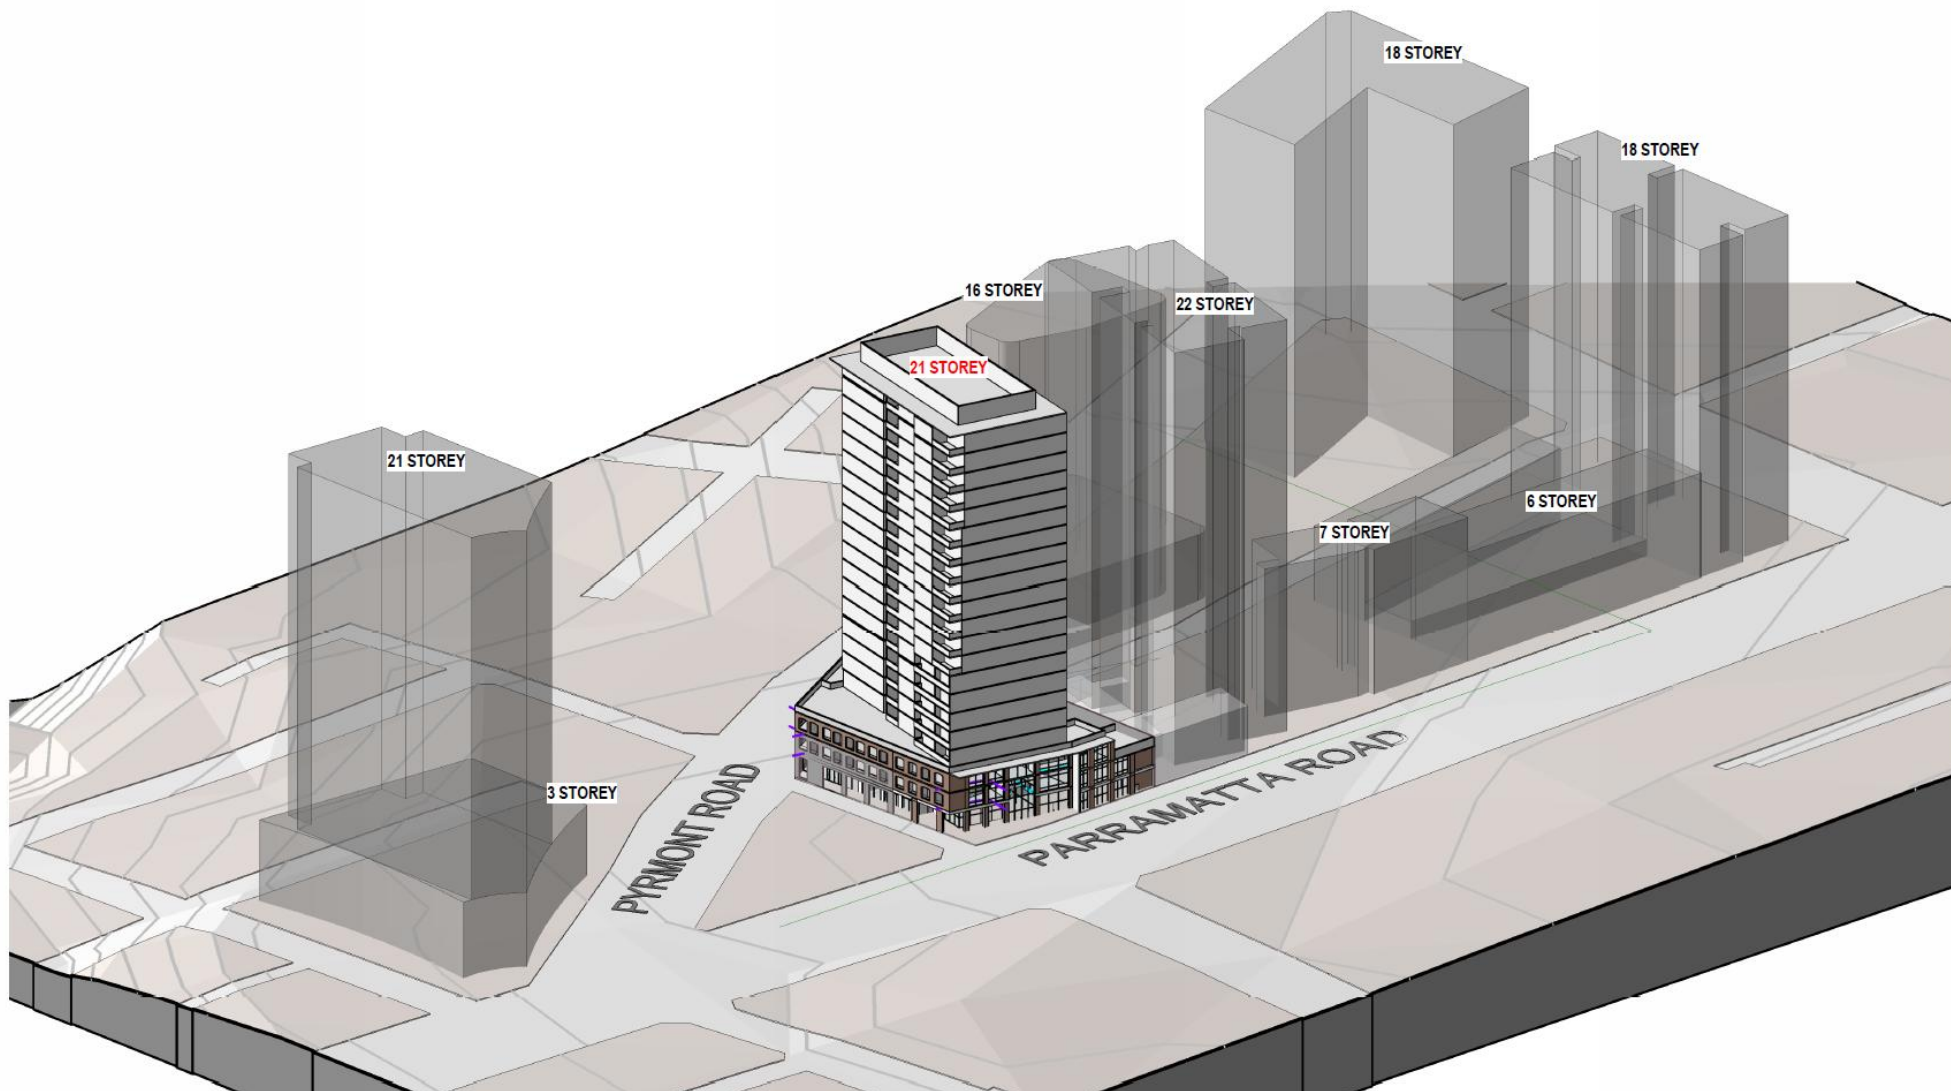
Proposal and surrounding emerging built form (Dickson Rothschild)
